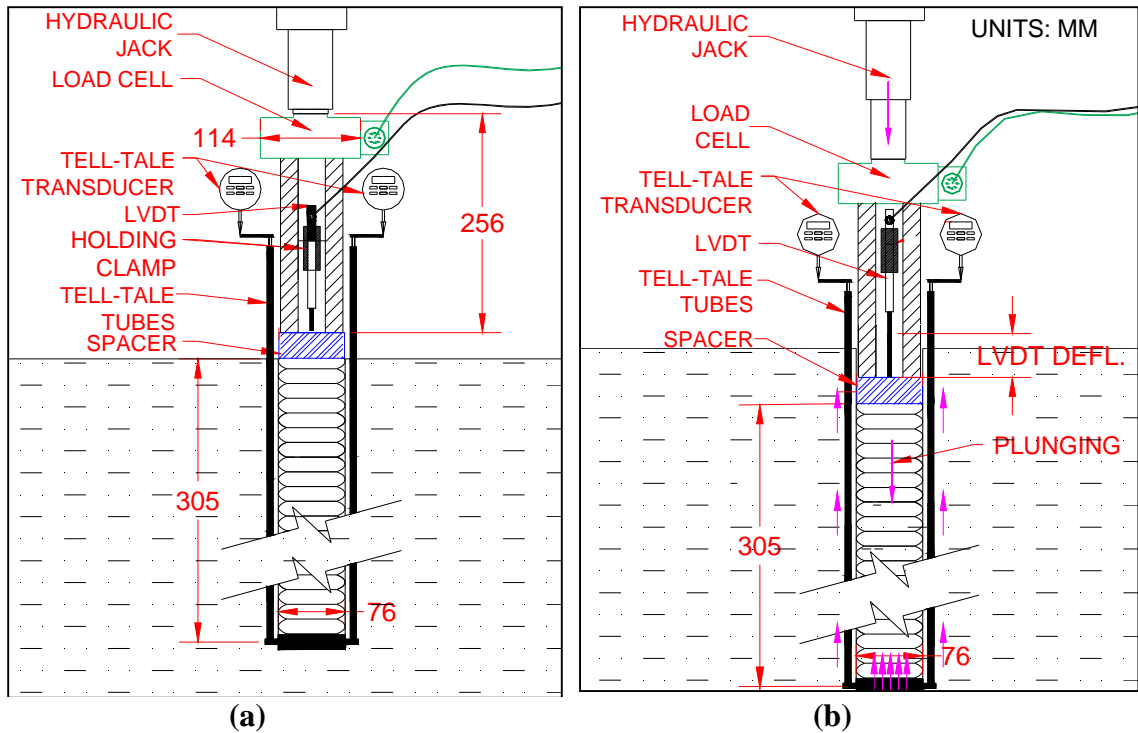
(a) 305 mm pier prior to testing and (b) after plunging failure
